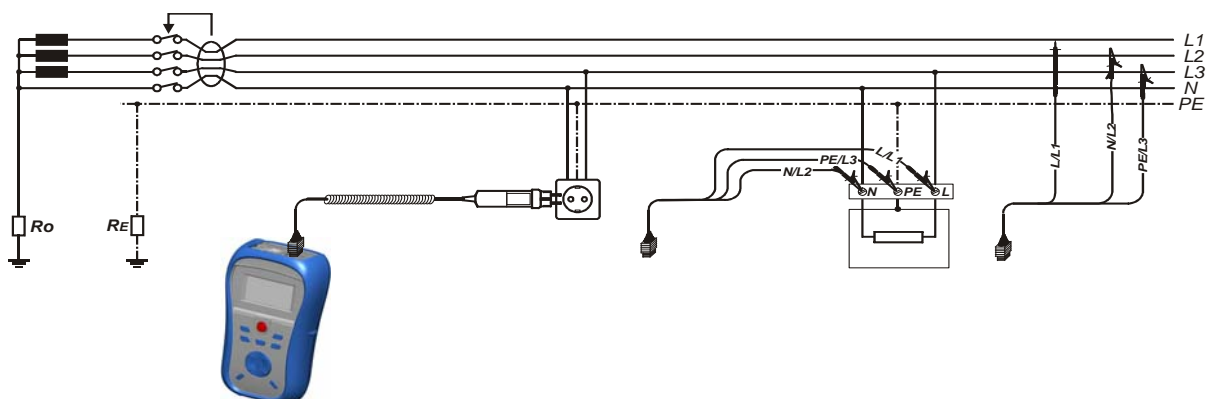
Connection of plug commander and universal test cable in single-phase system
